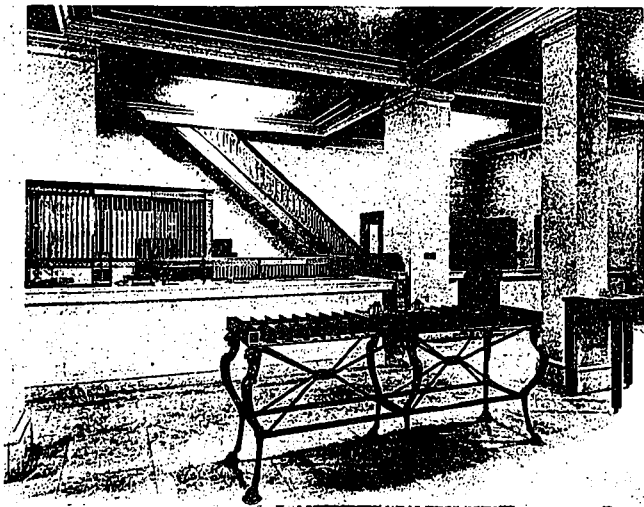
DETAIL OF MEZZANINE CEILING, NORTH AND SOUTH ENDS OF BANKING ROOM.
